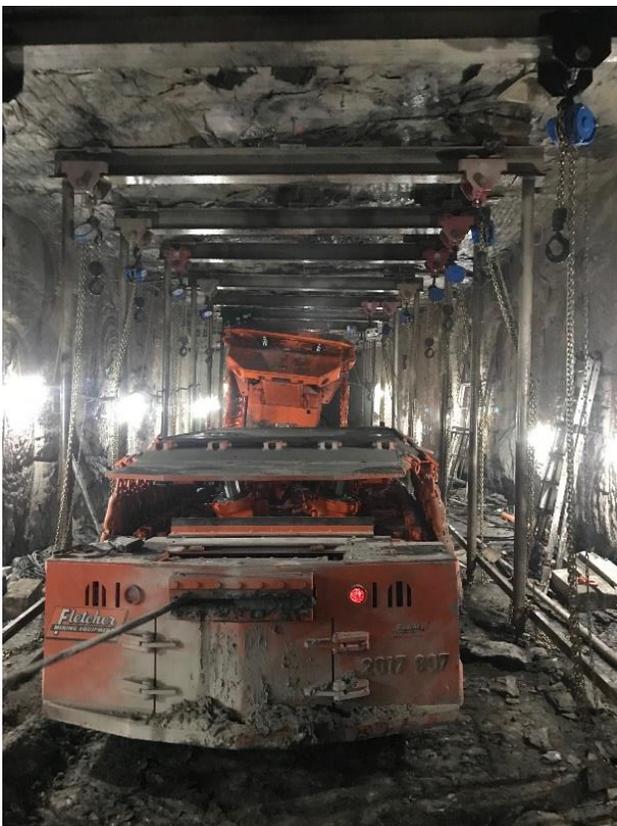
Mobile Roof Support Disassembly and Assembly Area
